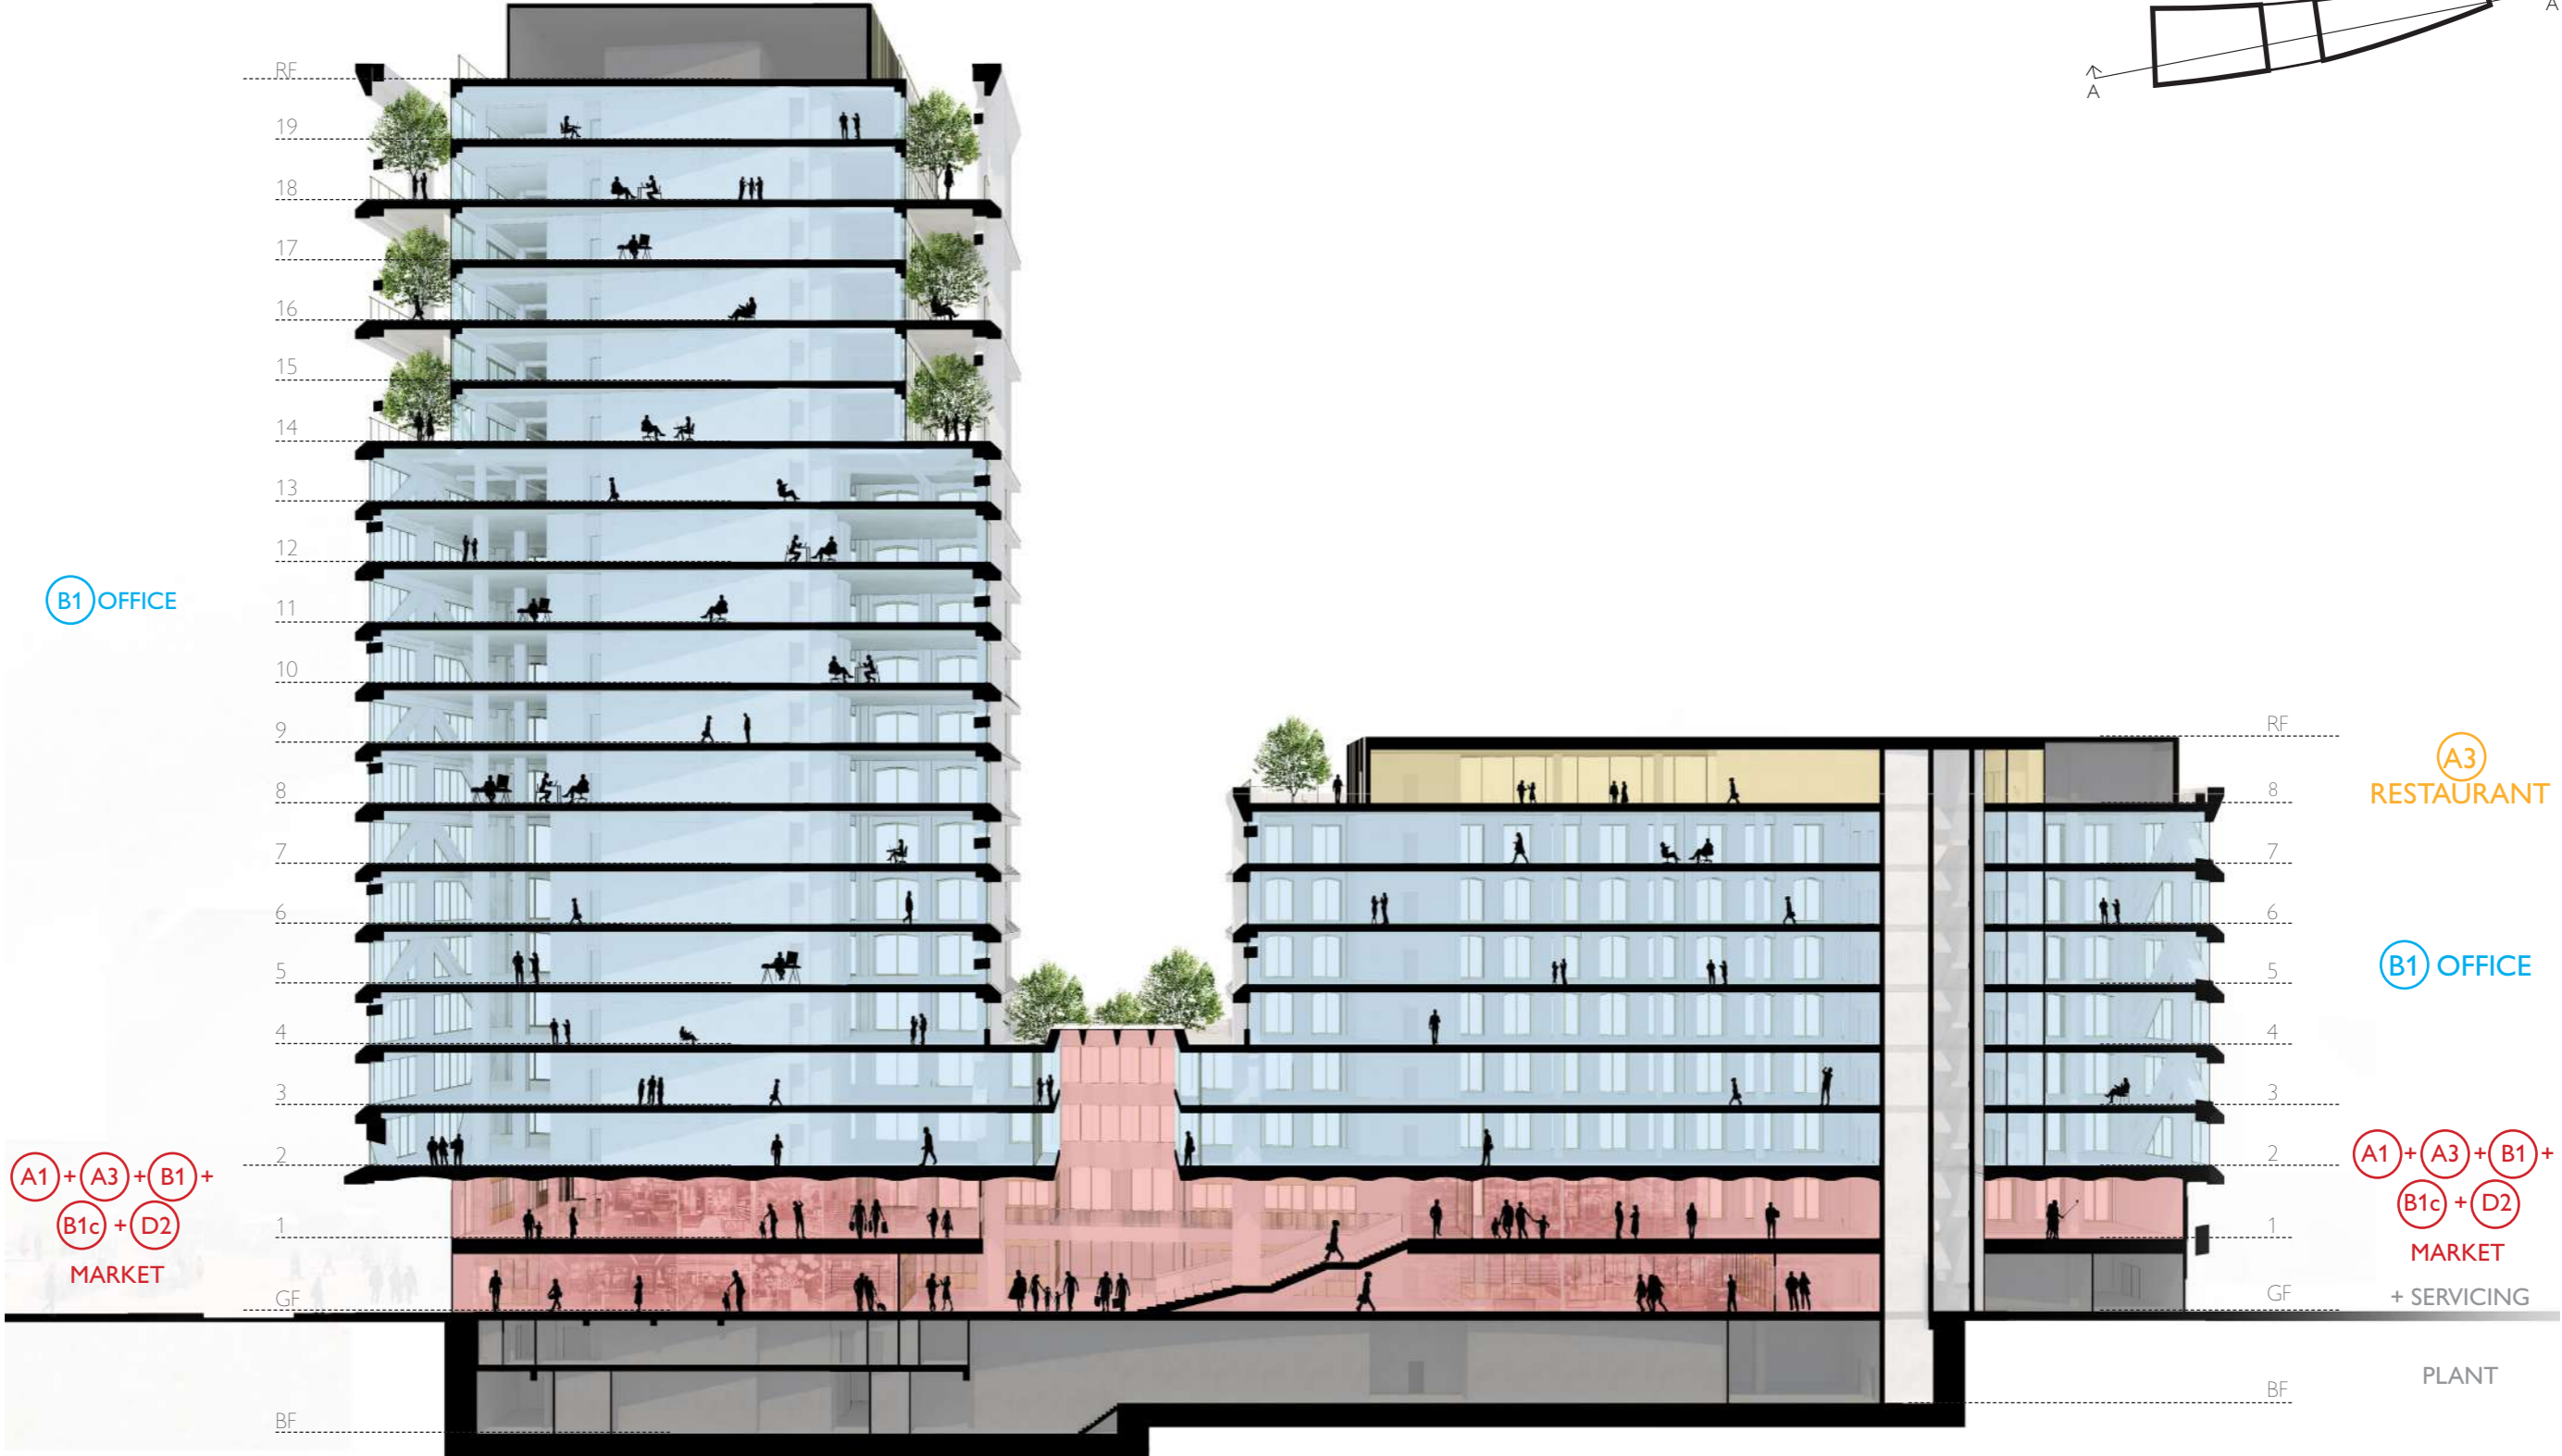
Perspective Section Diagram of Building Uses
